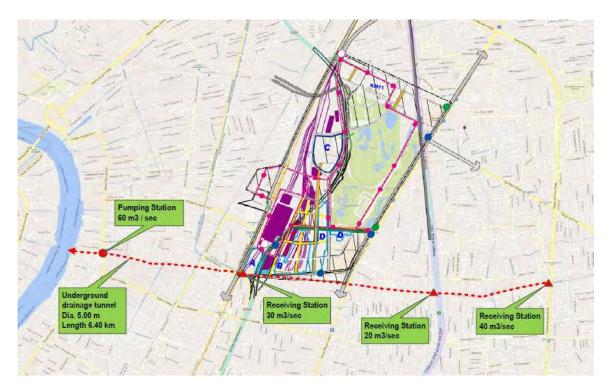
Beneath Klong Bang Sue Trunk Drain Pipe (under Construction)
